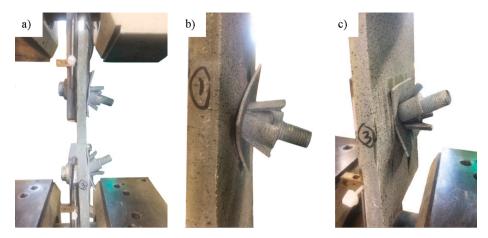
Ultimate failure under static loading. a) entire specimen, b) S2-2-T connector, c) S2-2-B connector.
